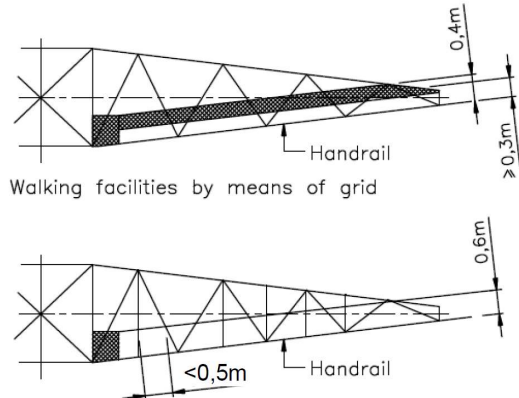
Walking Facilities in Cross-Arms of Lattice High-Voltage Towers [6,7]
